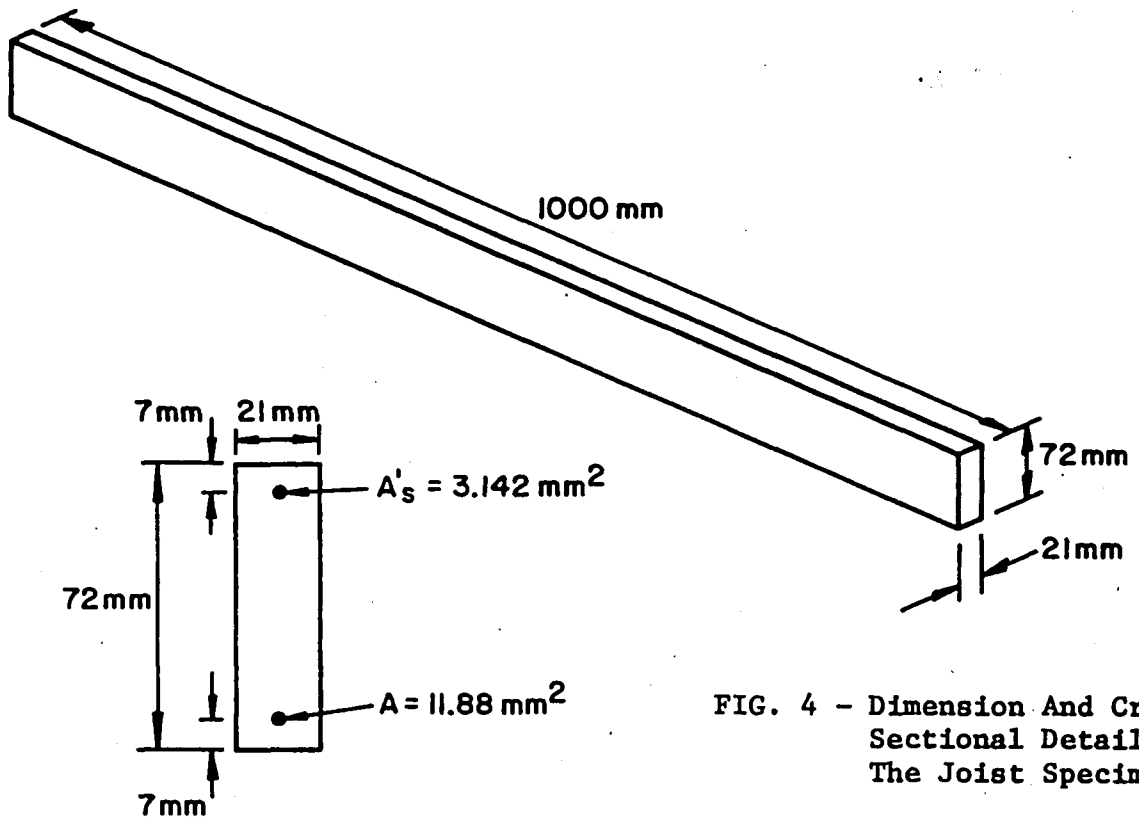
Dimension And Cross-Sectional Detail Of The Joist Specimen
